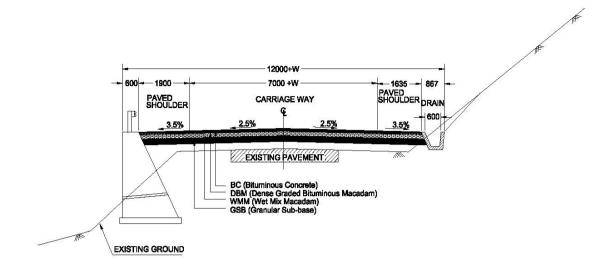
(2): Typical Cross Section for Widening Primarily to Valley Side
